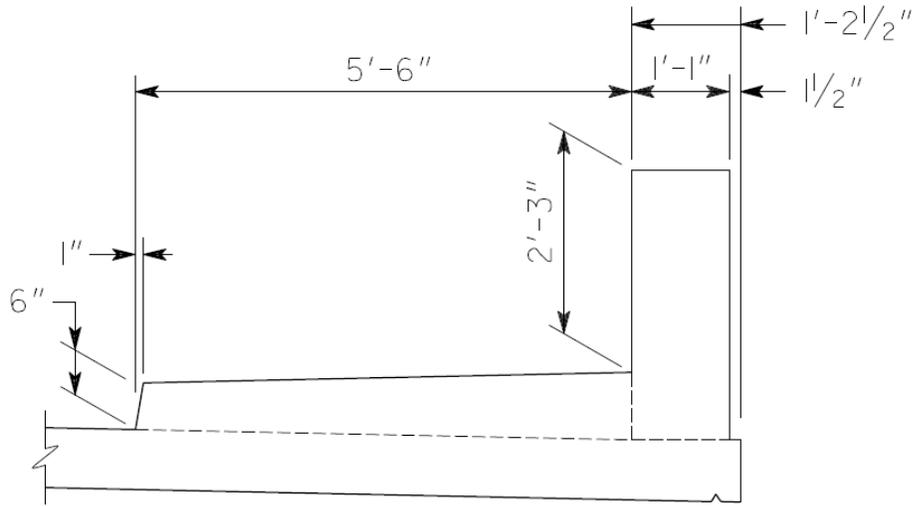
Original Concept - Typical Section View - BCP over GA 400
